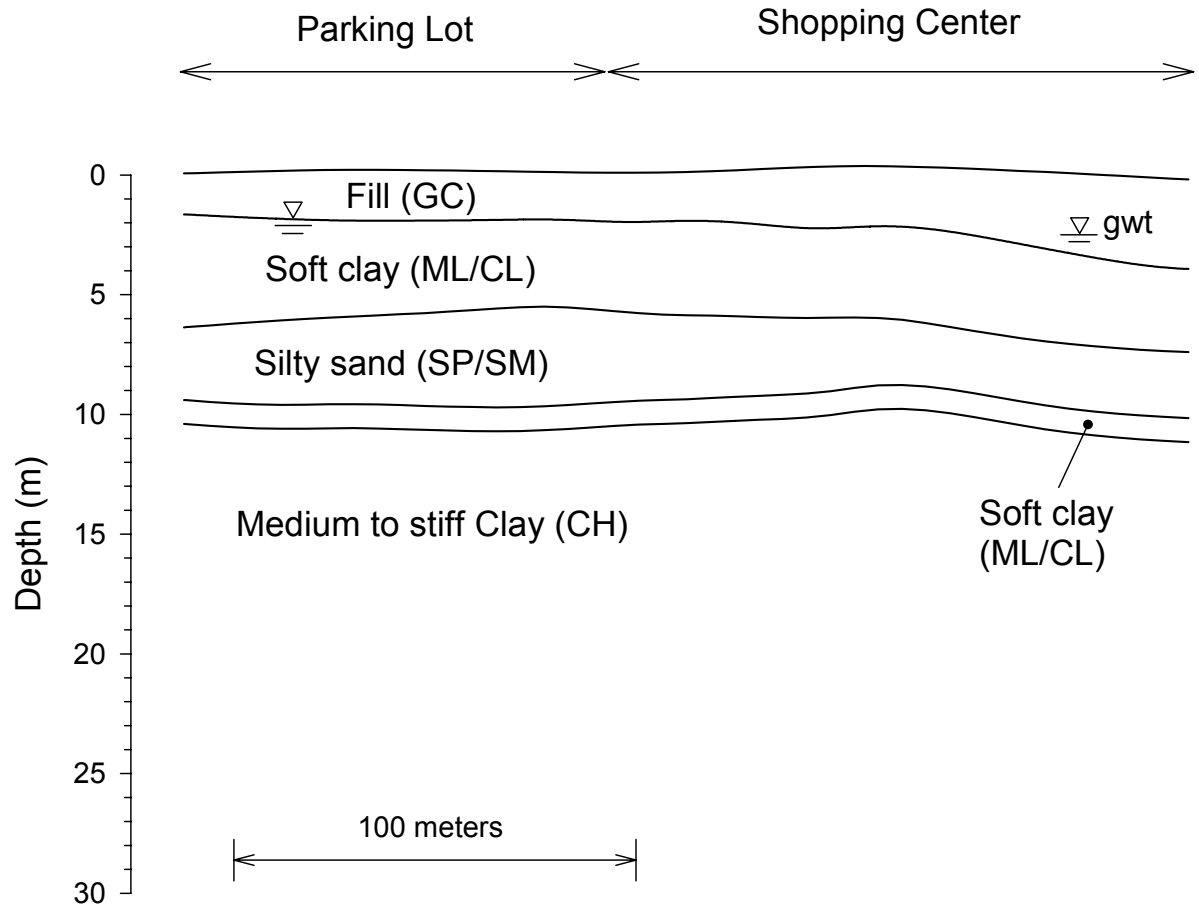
Cross section of soil layering through the Parking Lot and Shopping Center areas (Section A-A in Figure 4-2)
